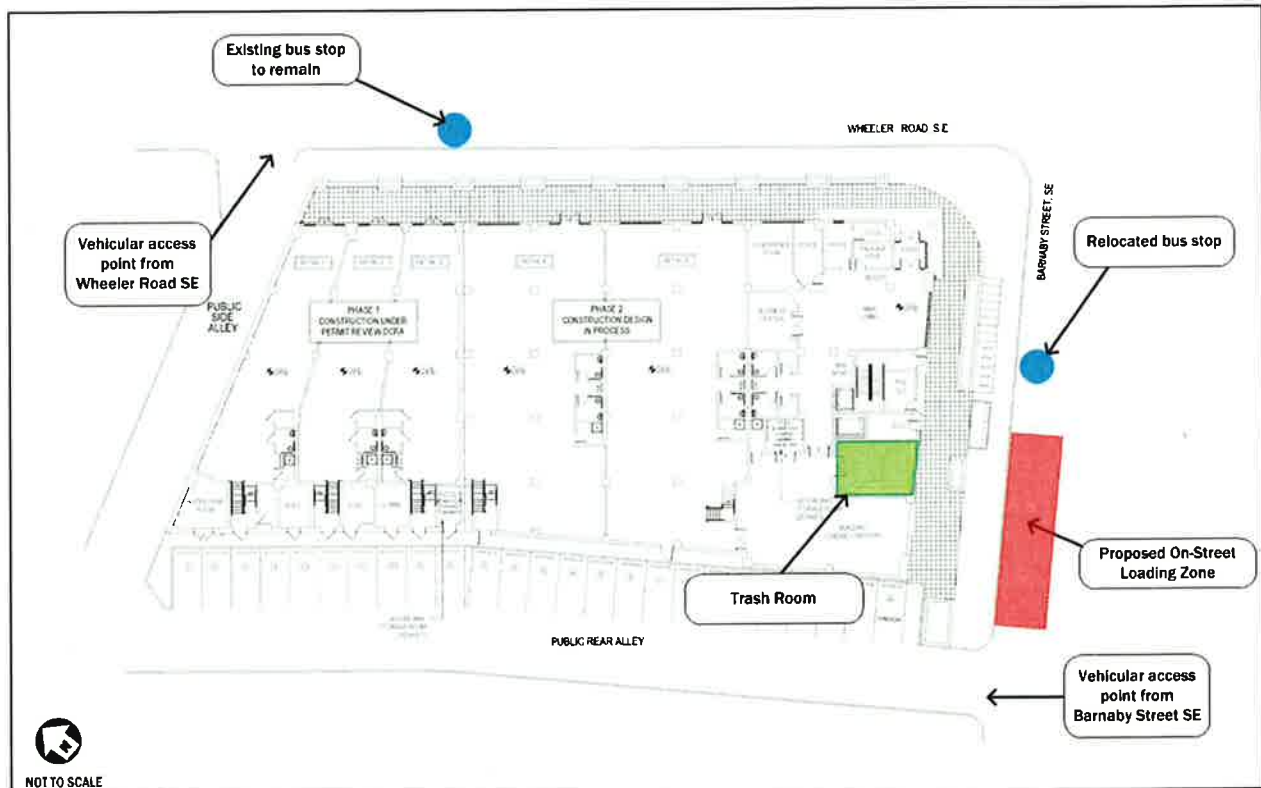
Proposed Site Layout and Access. Source: Applicant's Supplemental Report 5/16/14. Gorove/Slade.
